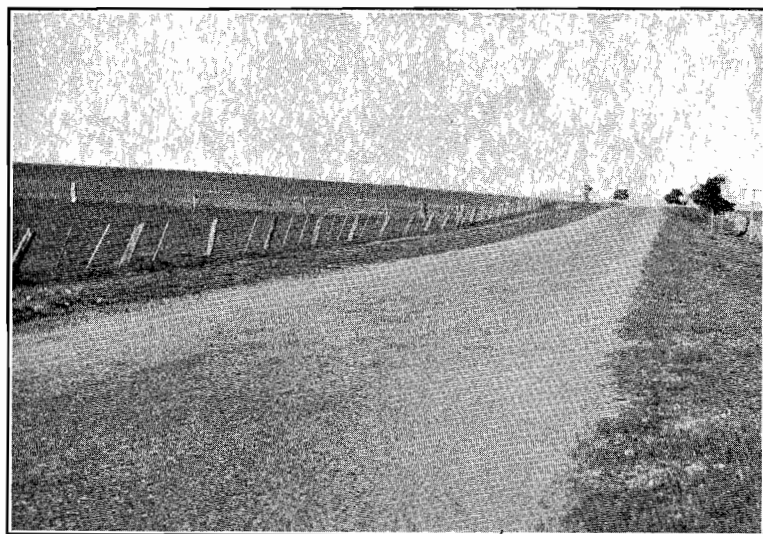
Hume Highway, near Beveridge, after reconstruction.
